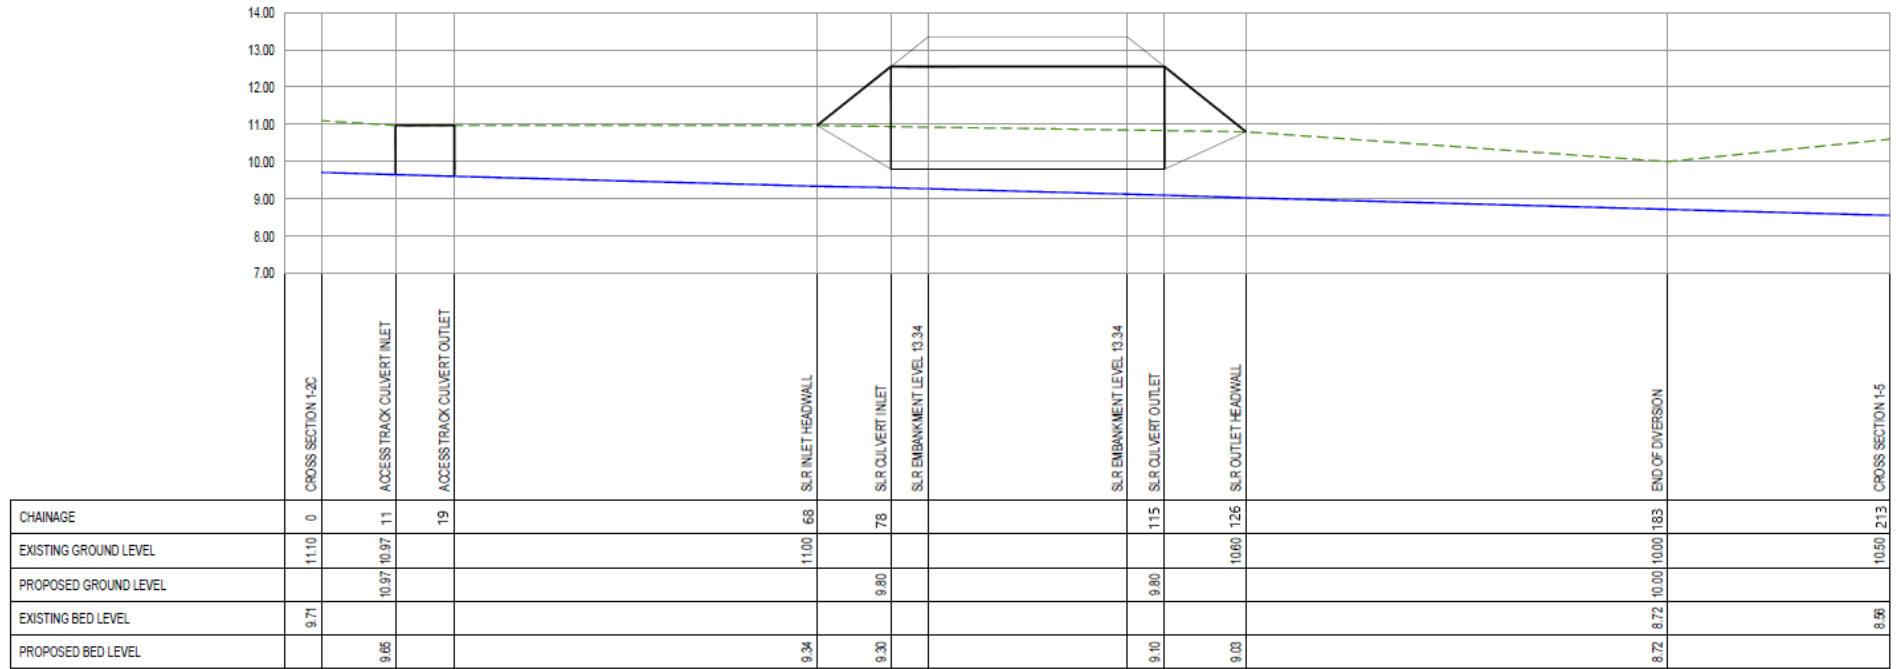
Cross-section of portal culvert at crossing 1 (extract from drawing no. SZC-AD0310-WSP-SLRHDG-ZZ0000-DRW-HCD-300002)
